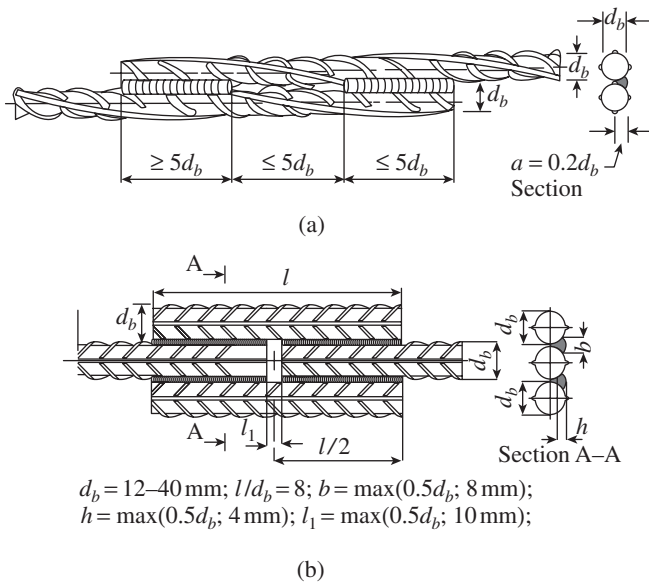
Details of welded lap joints (a) Single lap (b) Double lap
